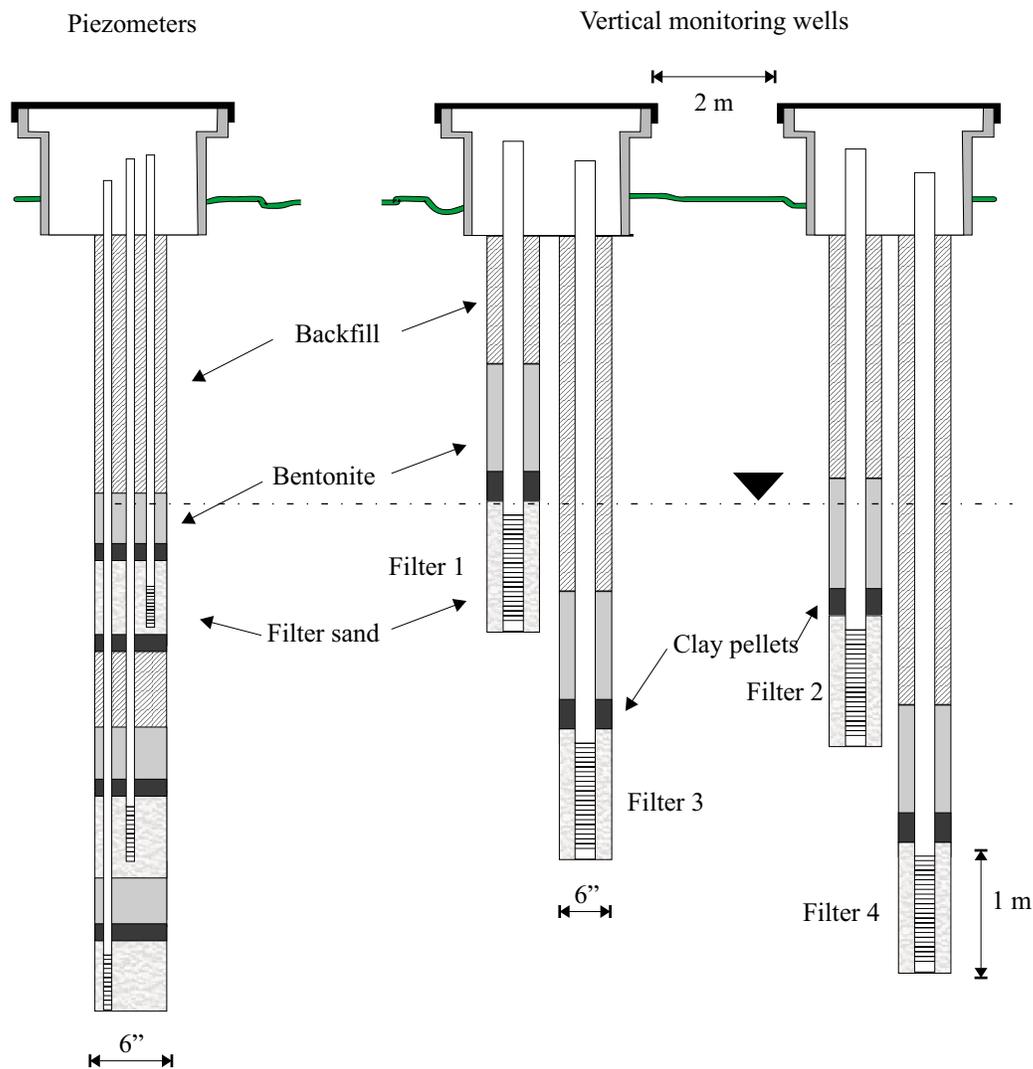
Construction of a multiple-level piezometer and monitoring well at a clay till site.
